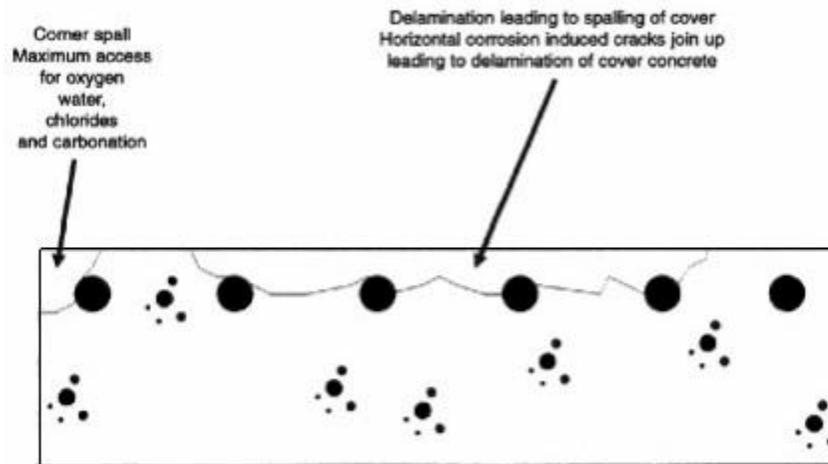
Corrosion induced cracking and spalling.
